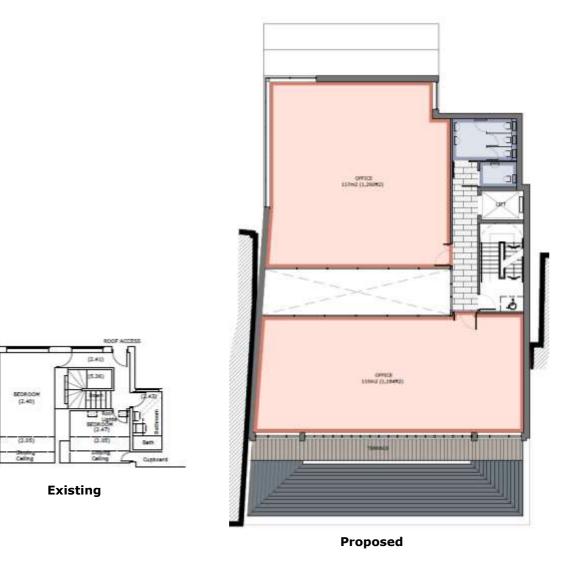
Existing fourth/fifth floor (left) and proposed fourth/fifth floor (right).
